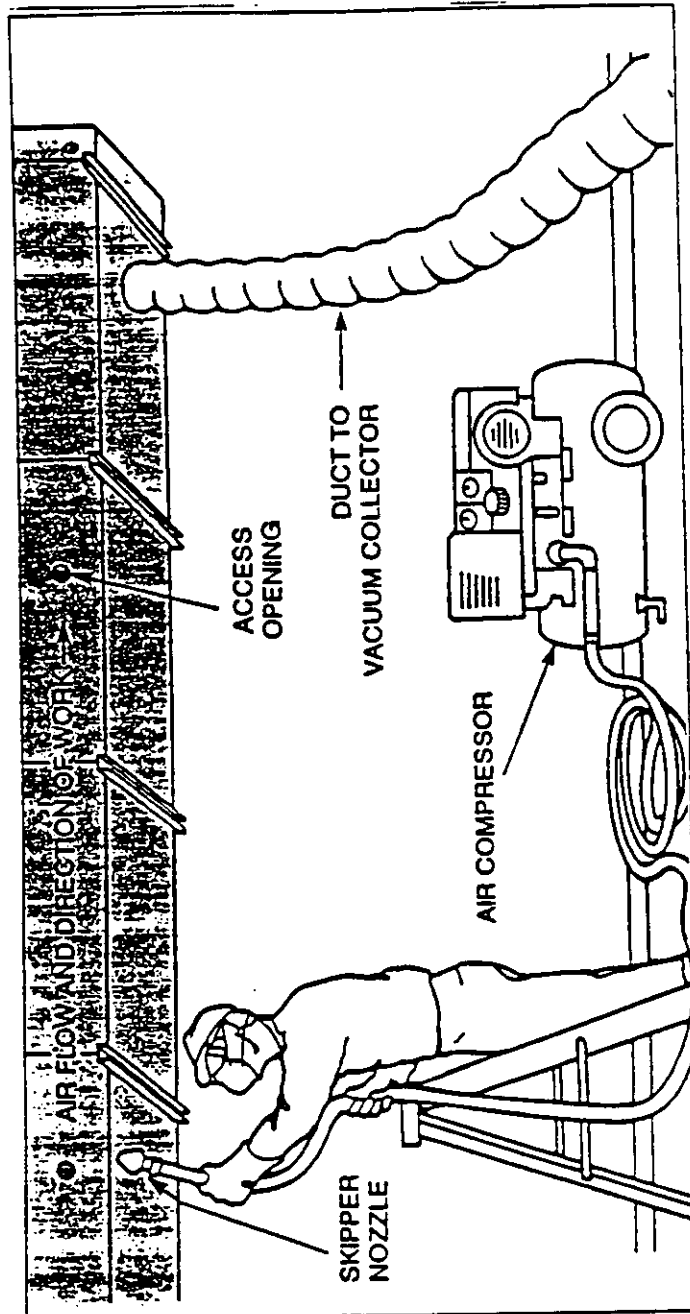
Air Washing Procedure (Source: "Cleaning Fibrous Glass Insulated Ducts," North American Insulation Manufacturers Association, page 17)
